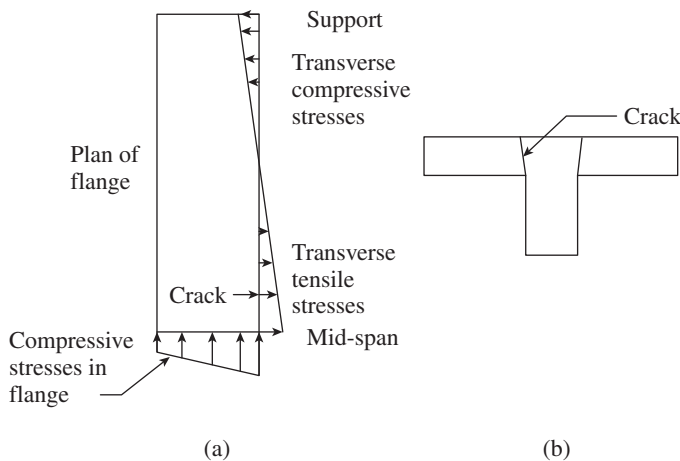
Flange cracking in T-beams (a) Plan (b) Section
